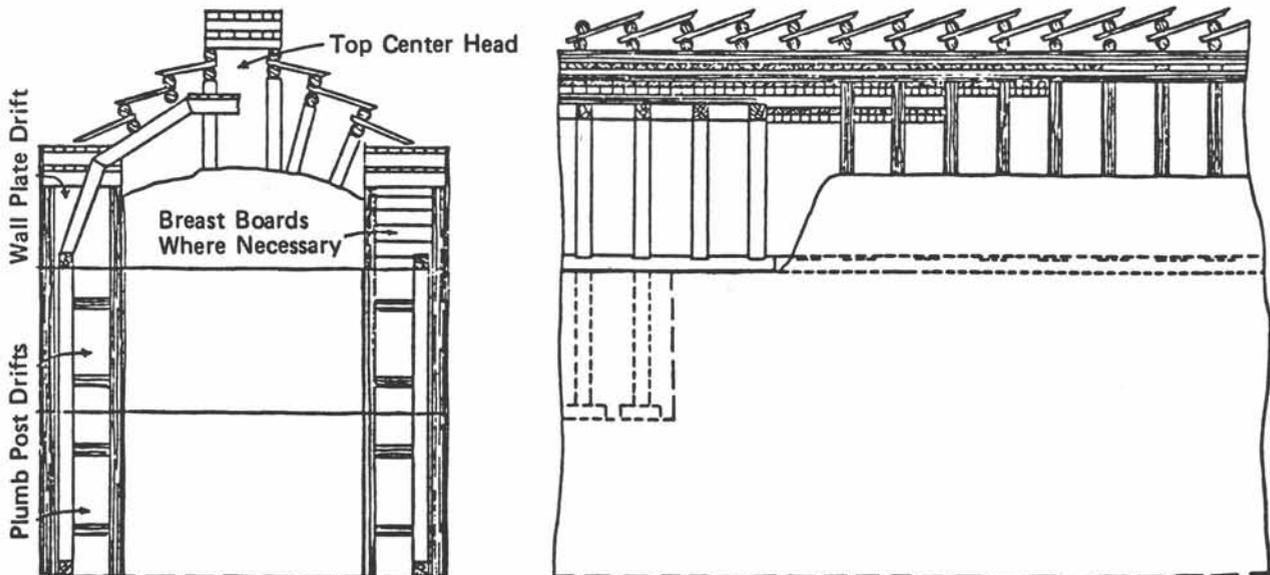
Excavation by top center heading and wall plate drifts using driven crown bars. From Baxter (1932) by permission, American Society of Civil Engineers.
